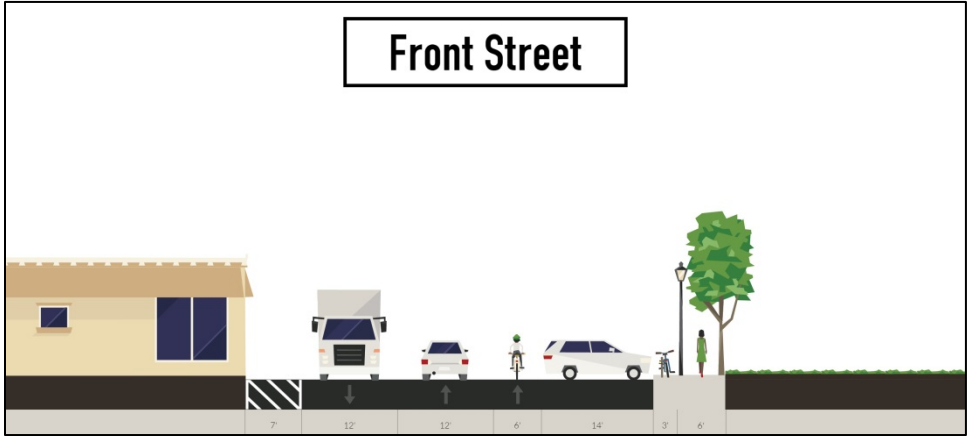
Front Street Cross-Section from Stillwell Avenue to US 101 – Alternative 3 (60 Feet Right-of-Way)
